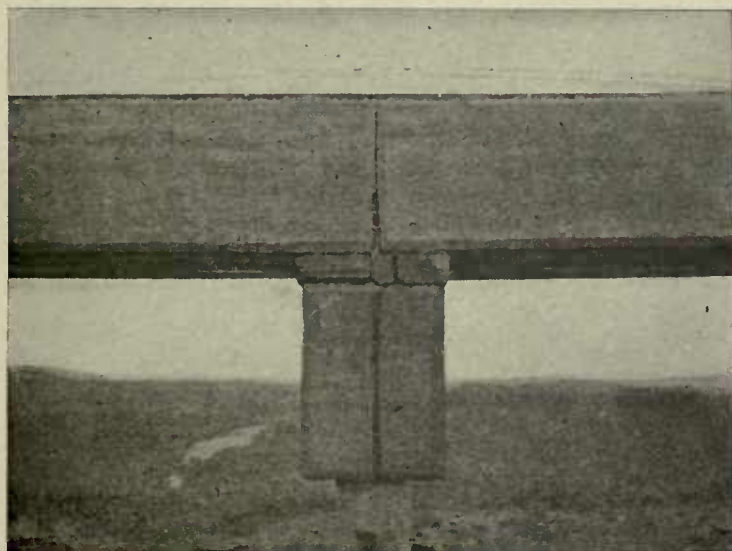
CONCRETE GIRDER, LEVELED UP AFTER SETTLEMENT.
